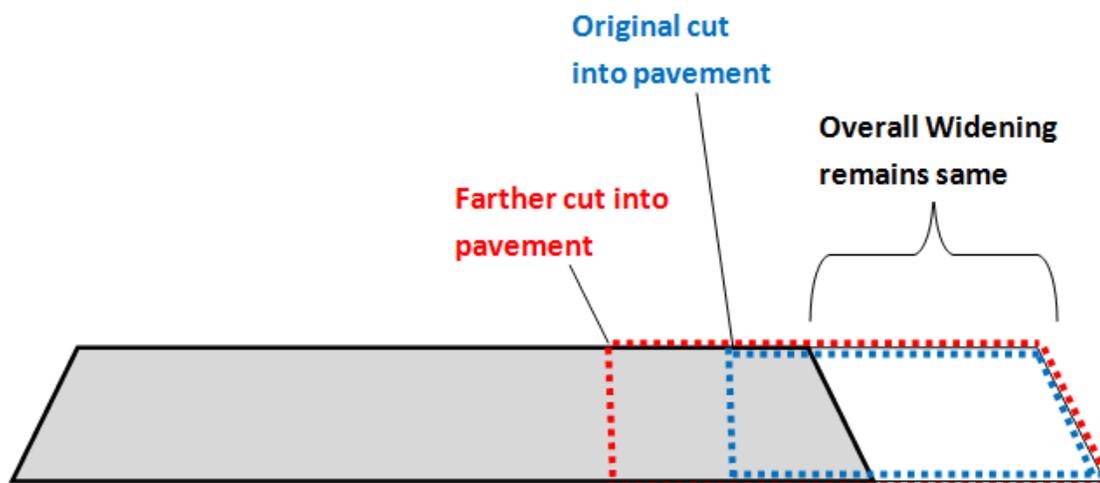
Joint position farther into the pavement to fit compaction equipment and get a better compaction result
